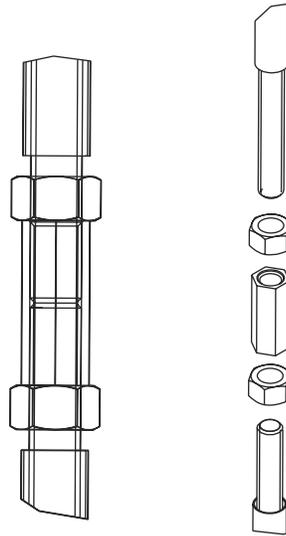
Threaded Rod and Coupling Nut Assembly2
